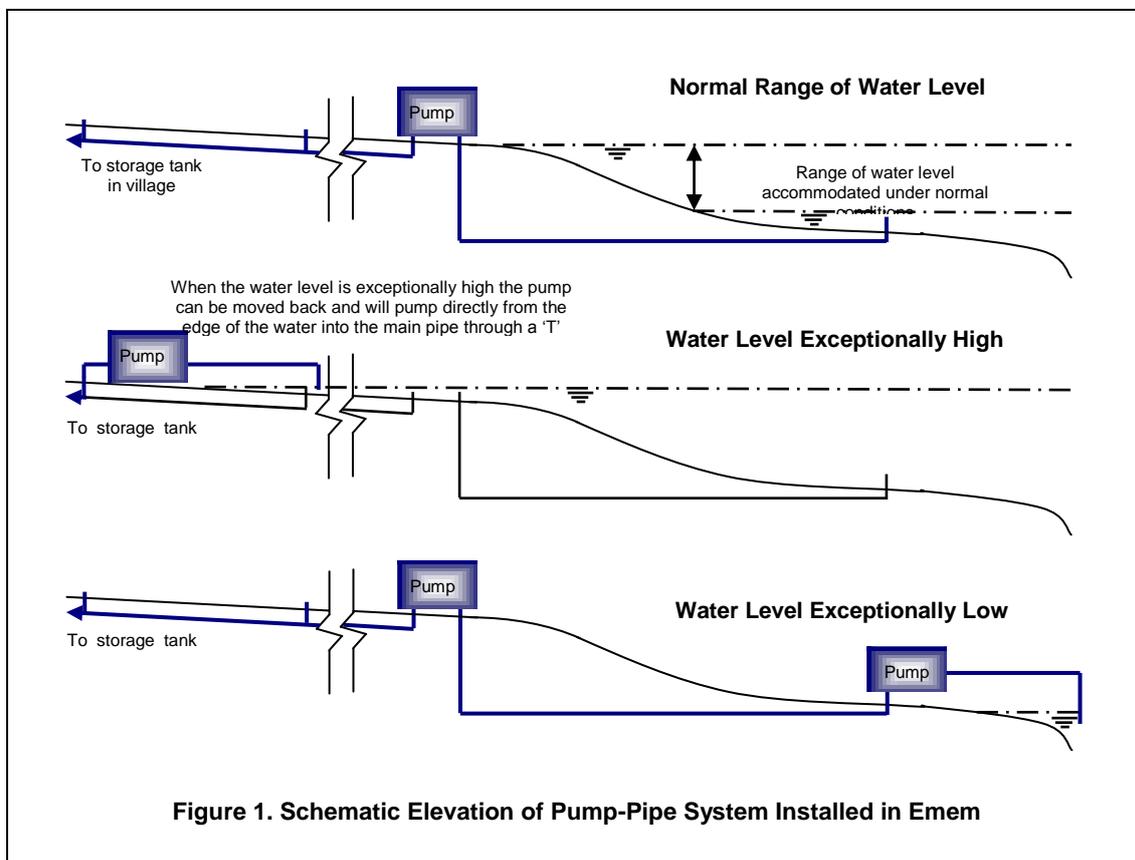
Schematic Elevation of Pump-Pipe System Installed in Emem
